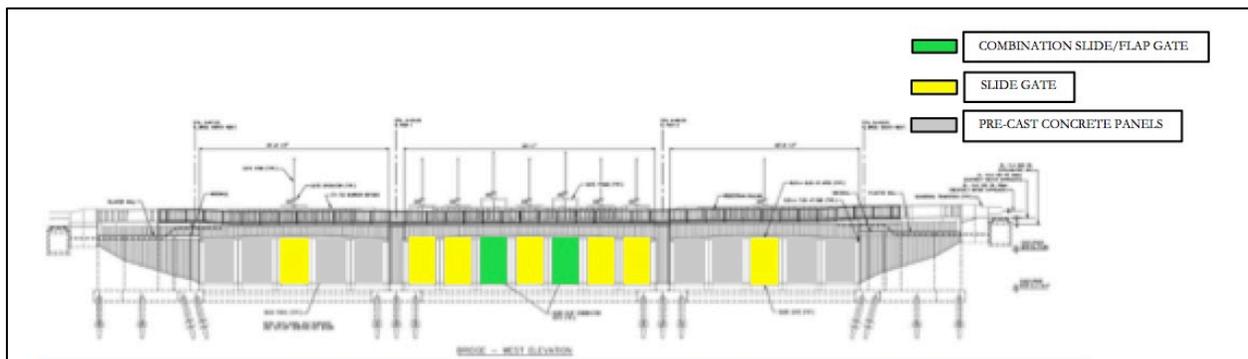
Box Beam Bridge Layout with Tide Control Structures
